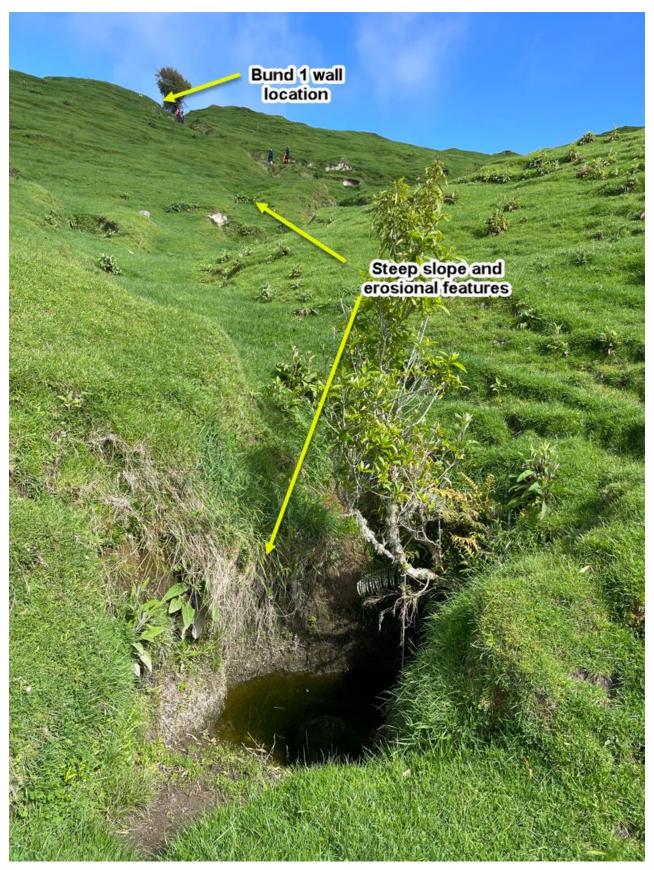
View upwards from downslope of the proposed bigger bund wall. Note the steep slope and deep erosional features.
